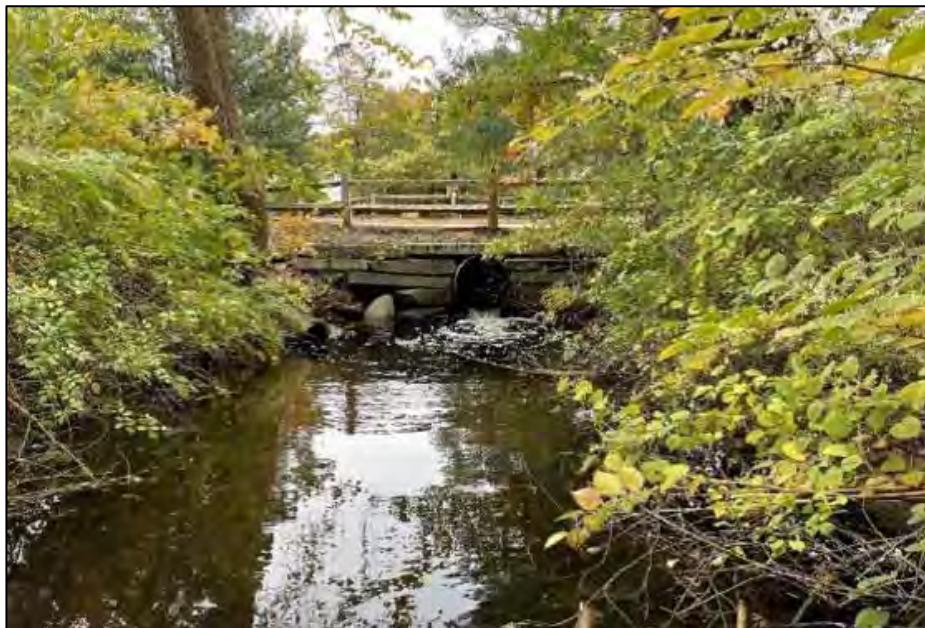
Jehovah's Witness Parking Lot –Downstream headwall and Channel.
